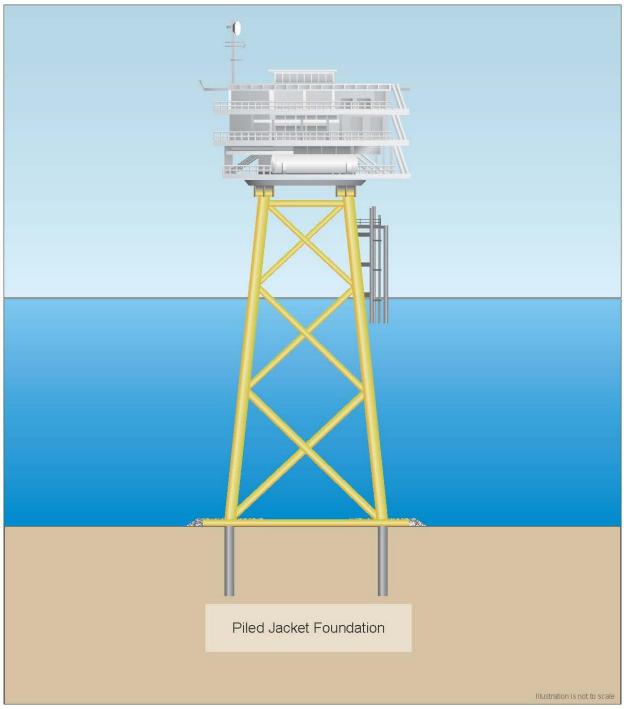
Offshore Substation Foundation Type – Piled Jacket
